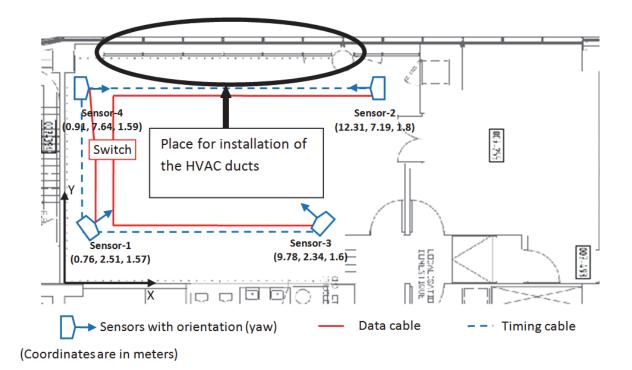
Floor Plan of the Construction Site and the Setting of the UWB System
